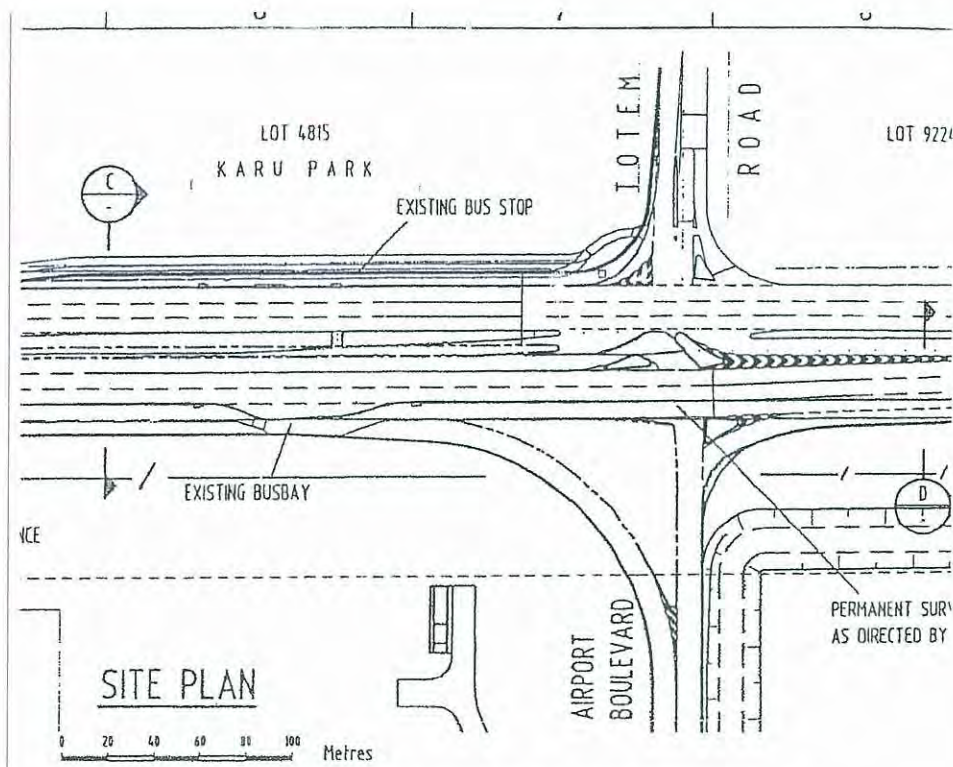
PLANNED BAGOT ROAD / TOTEM ROAD INTERSECTION LAYOUT
